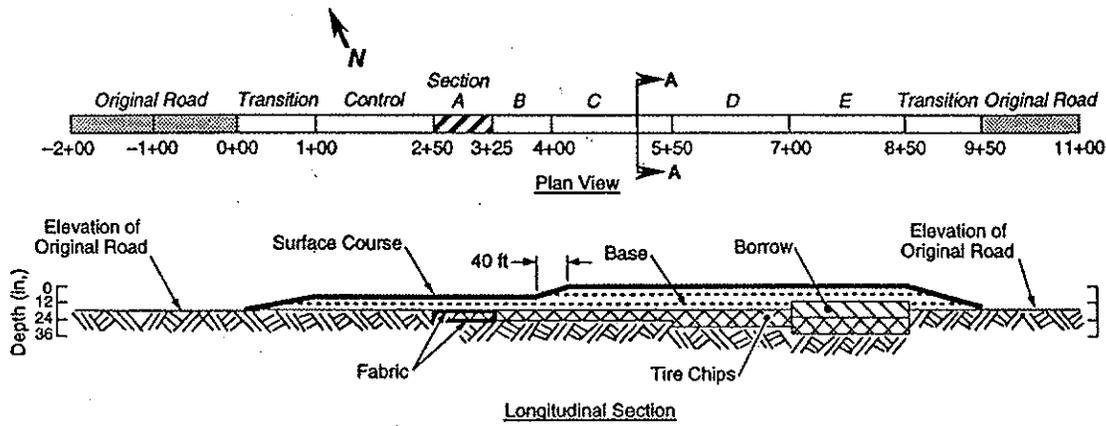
Plan and longitudinal views of test sections of Richmond field trial
